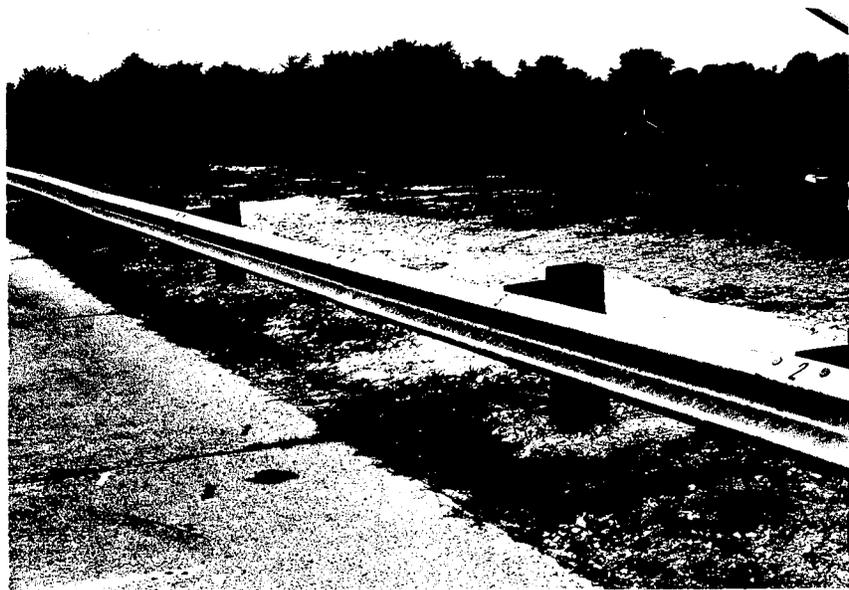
Washington nested W-beam wood-post guardrail with two posts over culvert (before test 7147-5).
